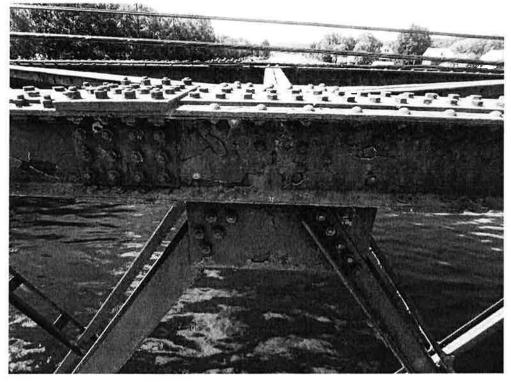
South tower inner truss at U12 – upper chord, lateral bracing and gusset plates with peeling paint and light rust.
